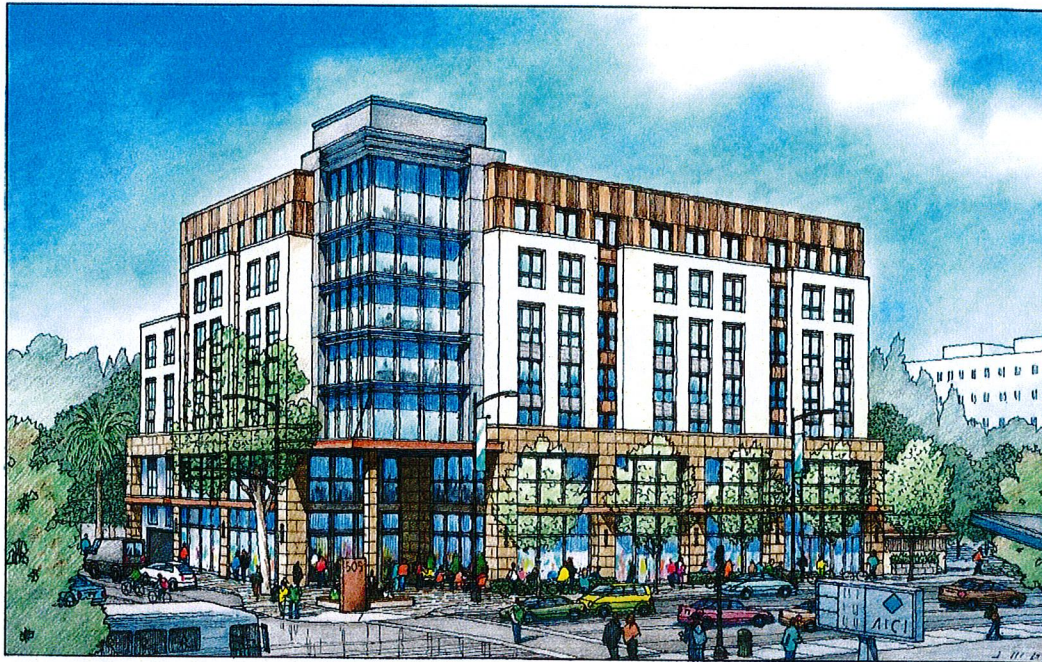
Elevation rendering of the proposed building as viewed at the corner of East Santa Clara Street and N. 11th Street looking north.
